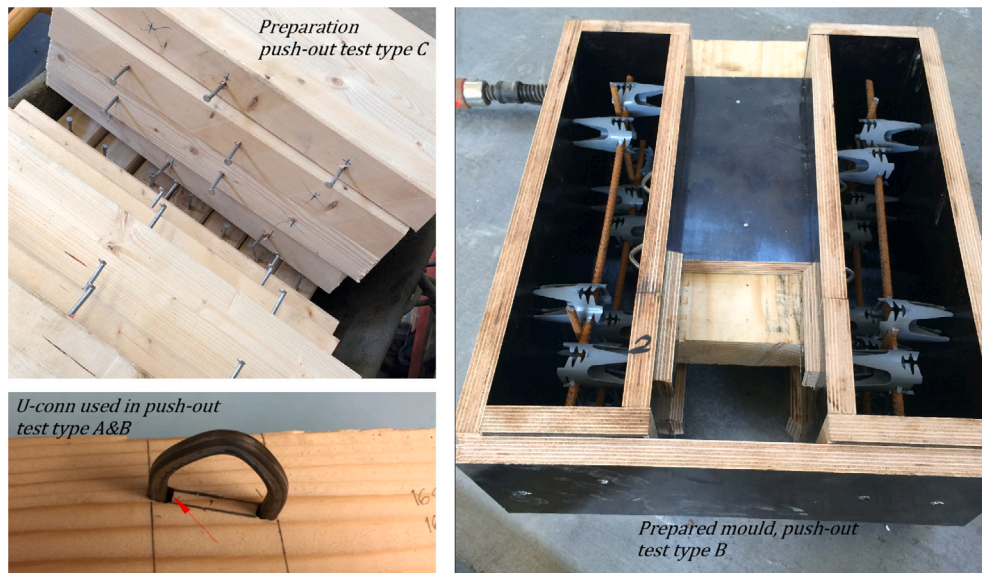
Preparation of push-out test specimens. Top left are cut glulam beams prepared with nails for test specimens of type C. Bottom left is a detail from one of the U-conns: pressed into timber, with the arrow indicating the impact on timber from the blunt tip. To the right, a mould prepared with timber beam and reinforcement before casting of test specimen type B is shown. (For interpretation of the references to colour in this figure legend, the reader is referred to the web version of this article.)
